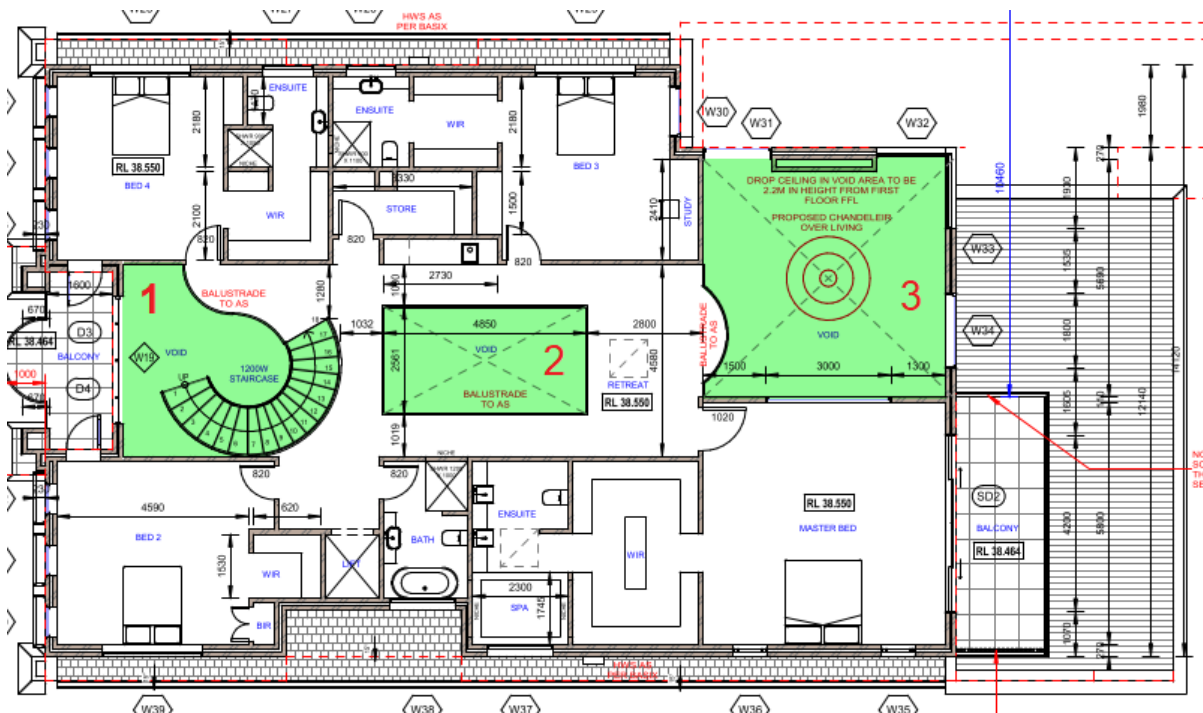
Extract of the proposed first floor (source: Nemco Design, dated 22/09/2020).
